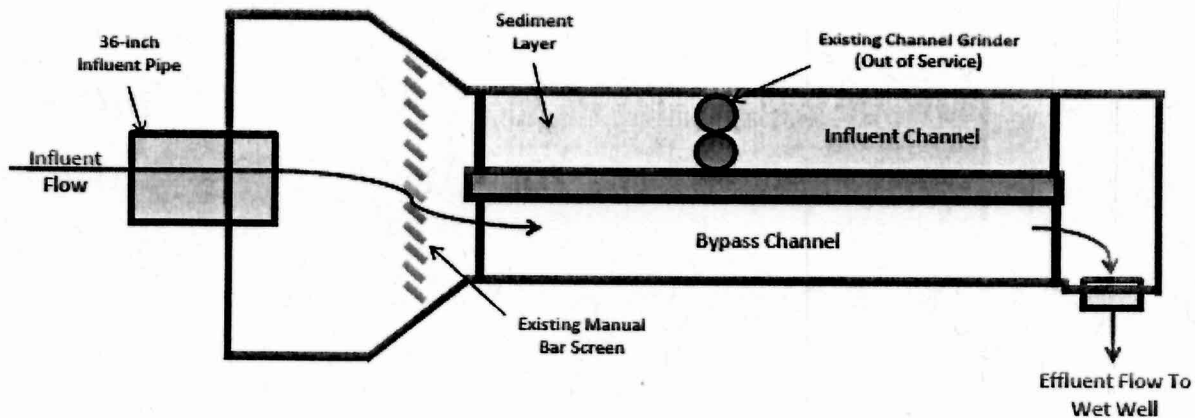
Plan View Schematic of the State Street Pumping Station – Inlet Screening
